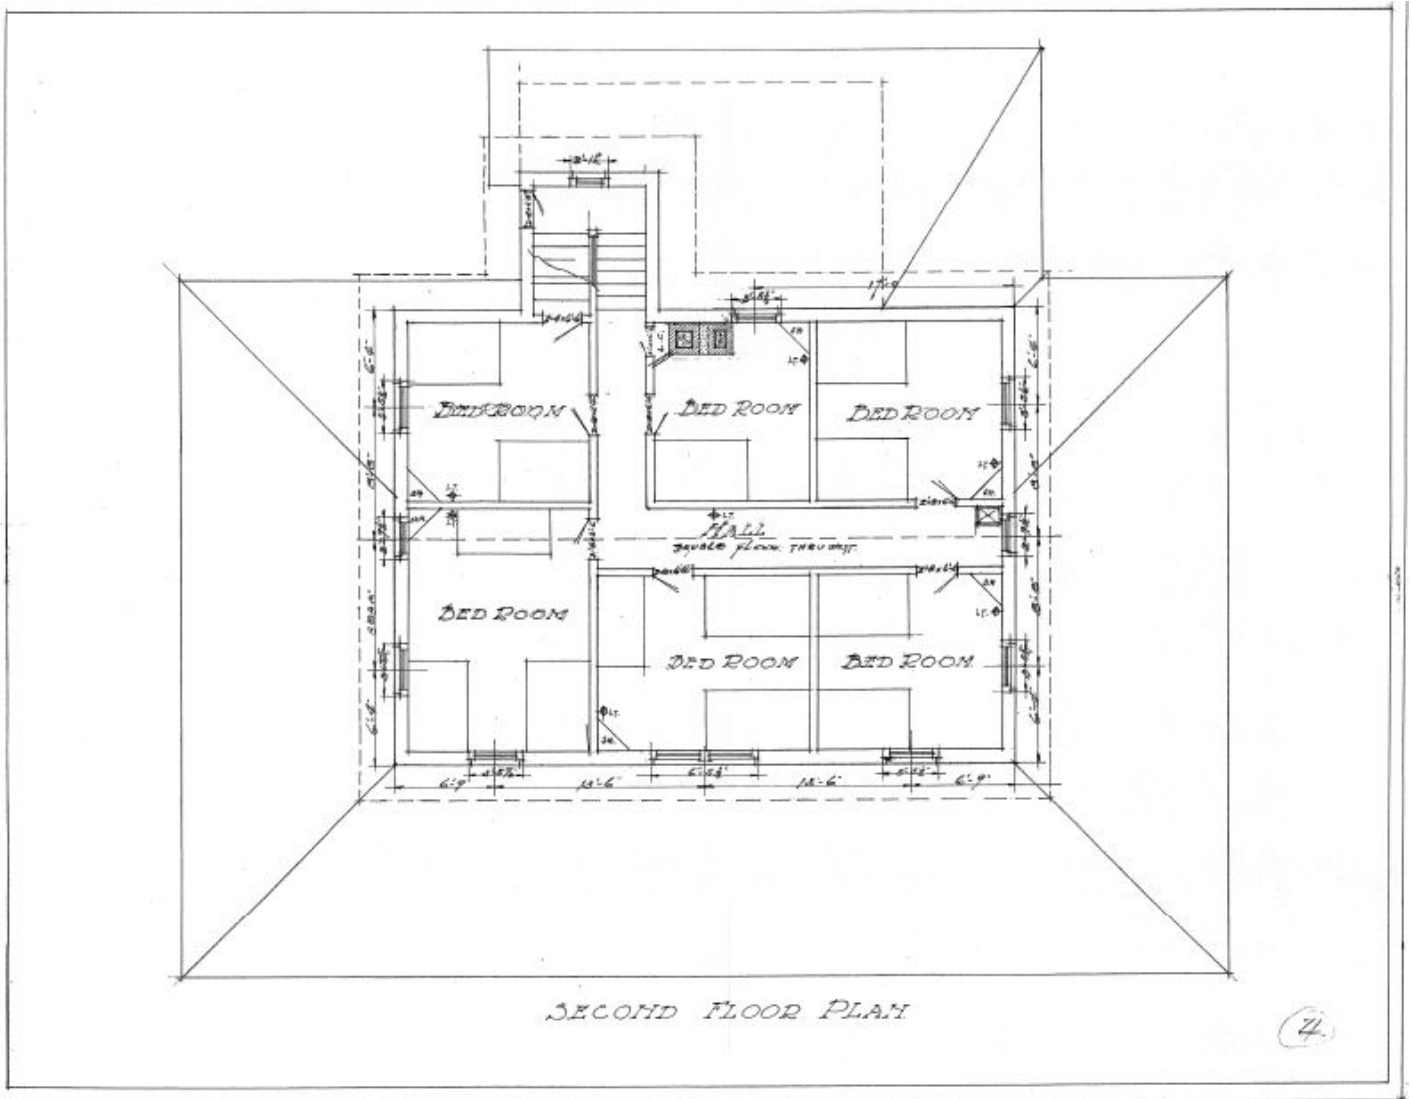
Second floor plan, Buechner & Orth. Note planned hipped corners for porch roof and kitchen roof.
